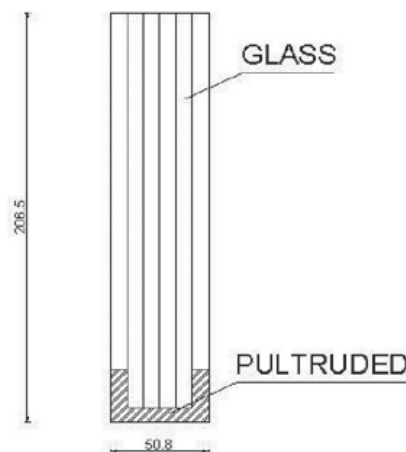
Section of glass beam of 6 layers with pultruded FRP profile in the tensile zone. [Speranzini et al., 2011]
